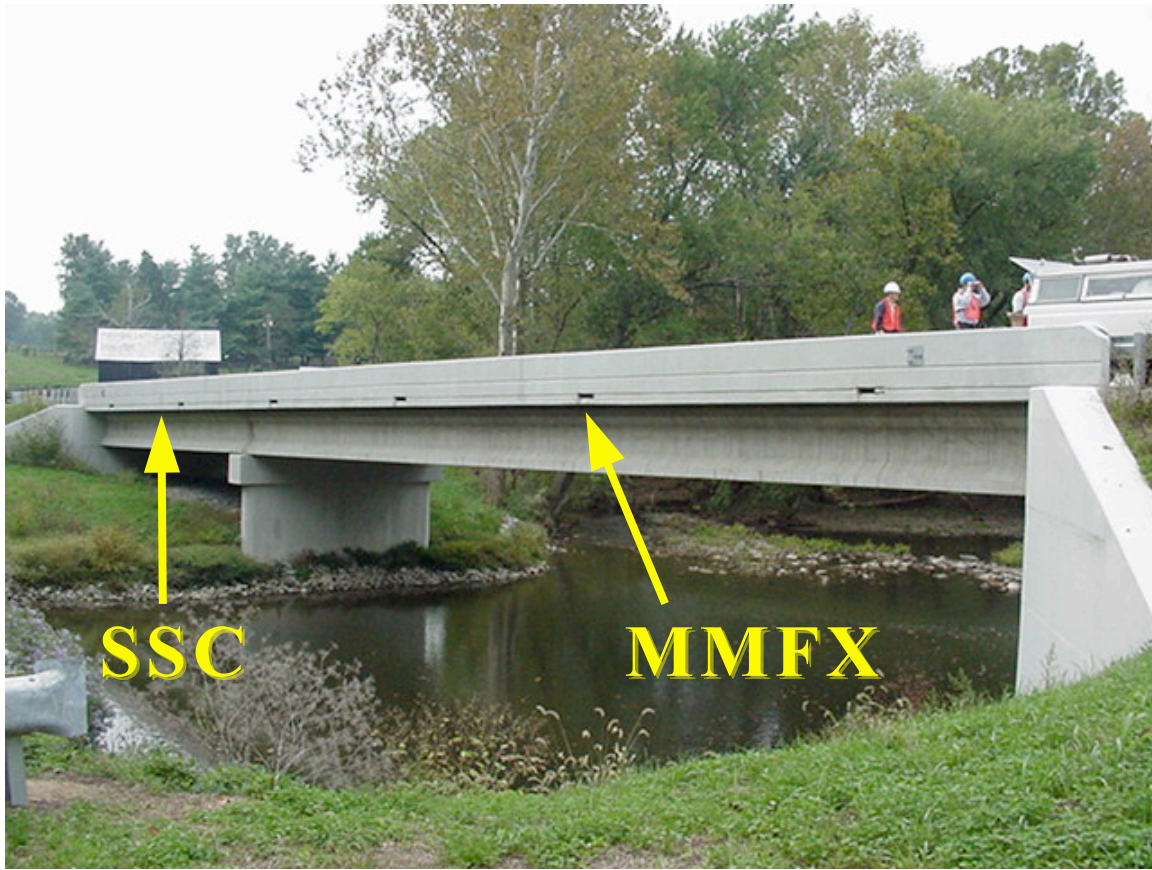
SSC and MMFX bars were used in the bridge deck of the CR 5218 Bridge in Scott County, Kentucky, USA
